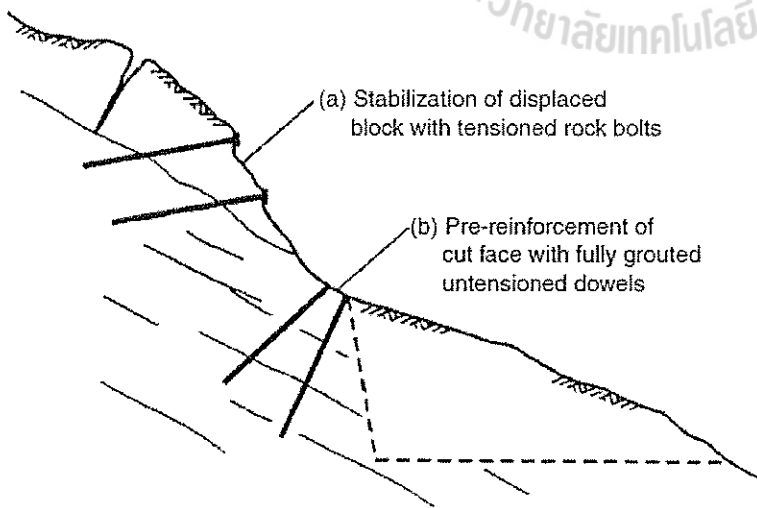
Reinforcement of a rock slope: (a) tensioned rock bolts in a displaced block; (b) fully grouted, untensioned dowels installed prior to excavation to pre-reinforce the rock (TRB, 1996).
